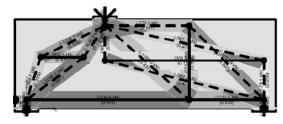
Conventional STM stress demand and demand-capacity ratio (Left side span: direct strut as bottle shape with single tie to account for horizontal reinforcement; Right side span: Additional Truss Element to account for horizontal reinforcement)
